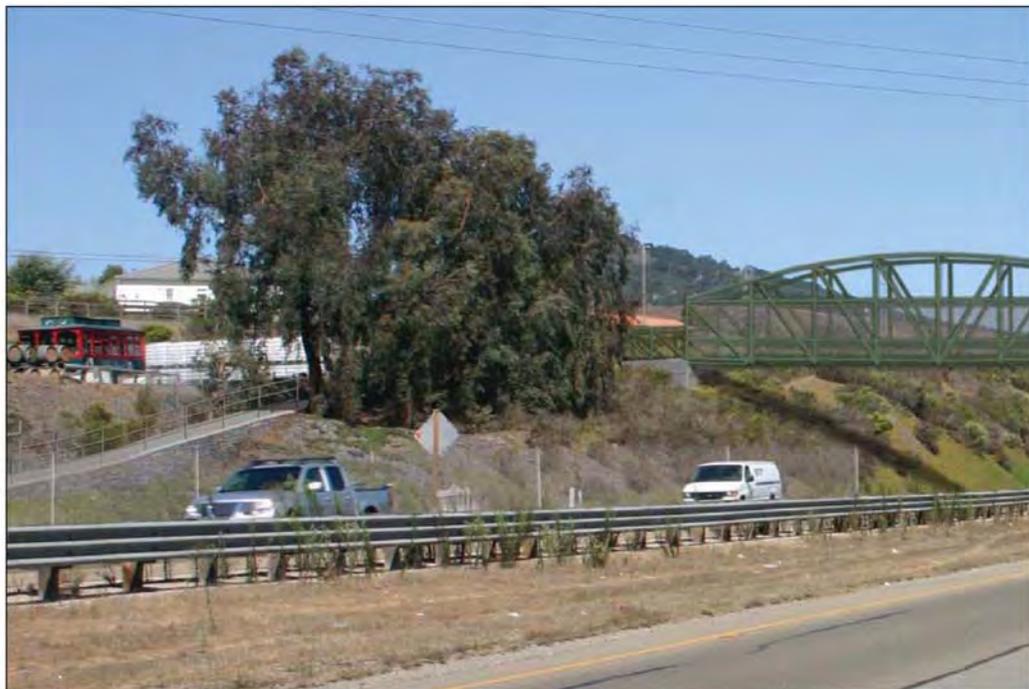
Photo B: Simulation of the proposed project – Gray-green Steel Truss Bridge Alternative C.
